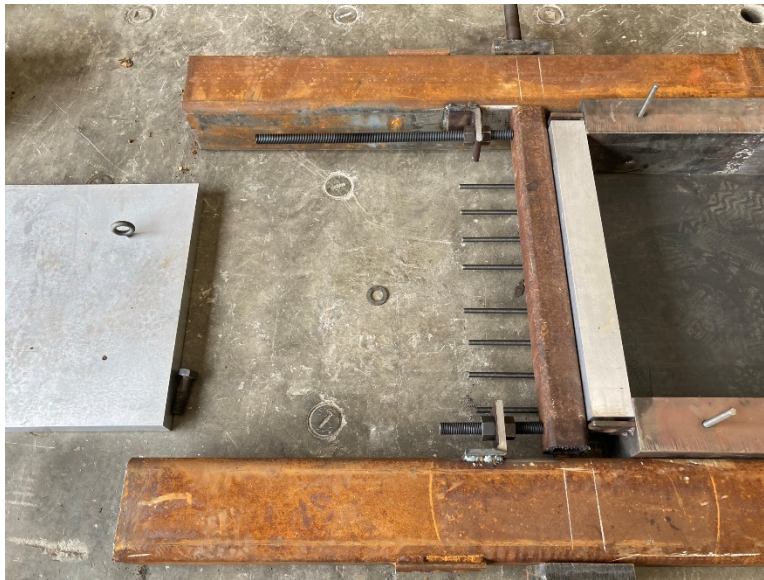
Threaded rods pass through drilled holes on the steel angles, to tighten or loosen the system.
